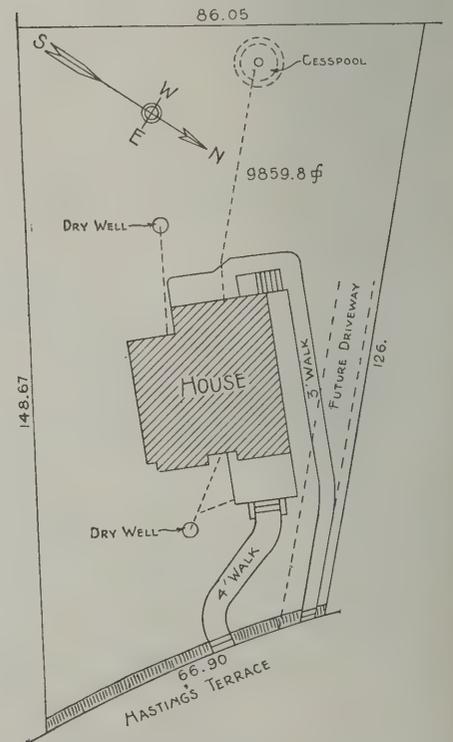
Block Plan—Scale 1/2 in. Equals 20 Ft.
